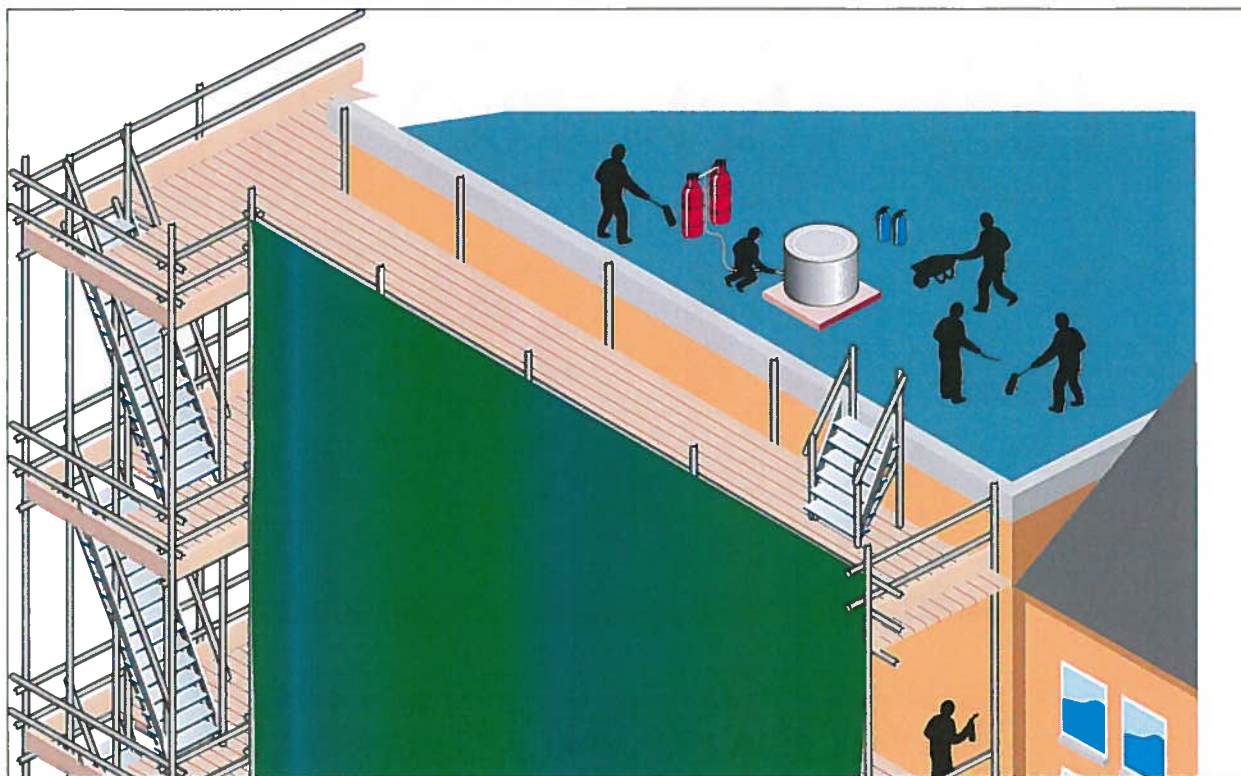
In this job, hot work on the roof and window renovation using blowlamps and substantial amounts of flammable substances mean the fire risk is high. Escape via ladders inside the sheeting could be difficult so external access is provided at one end. Some scaffold components have been omitted for clarity, eg roof edge protection is required. The escape route should lead away from the enclosure, where possible
